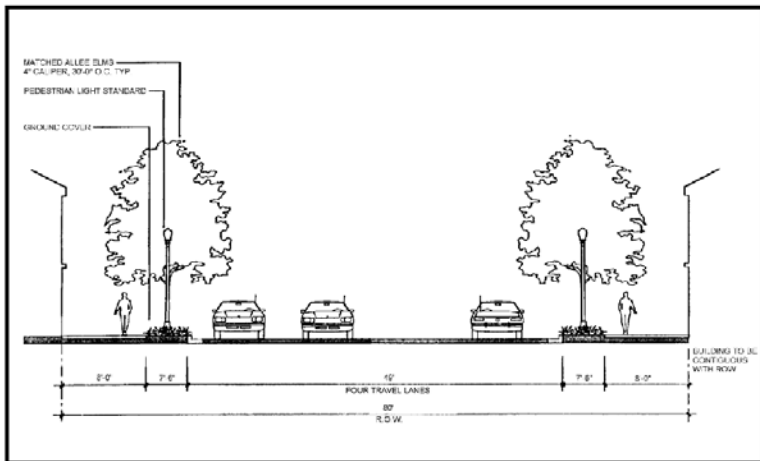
Bear Creek Parkway at Town Center (Undivided Cross Section)
